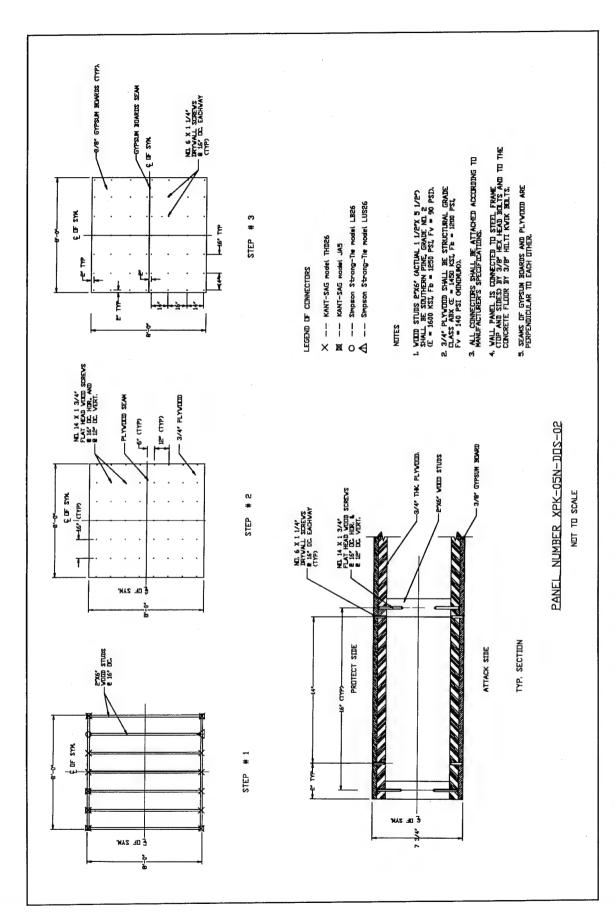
Engineering drawings for wall panel XPK-05N-DOS-02 (non-SI units)
